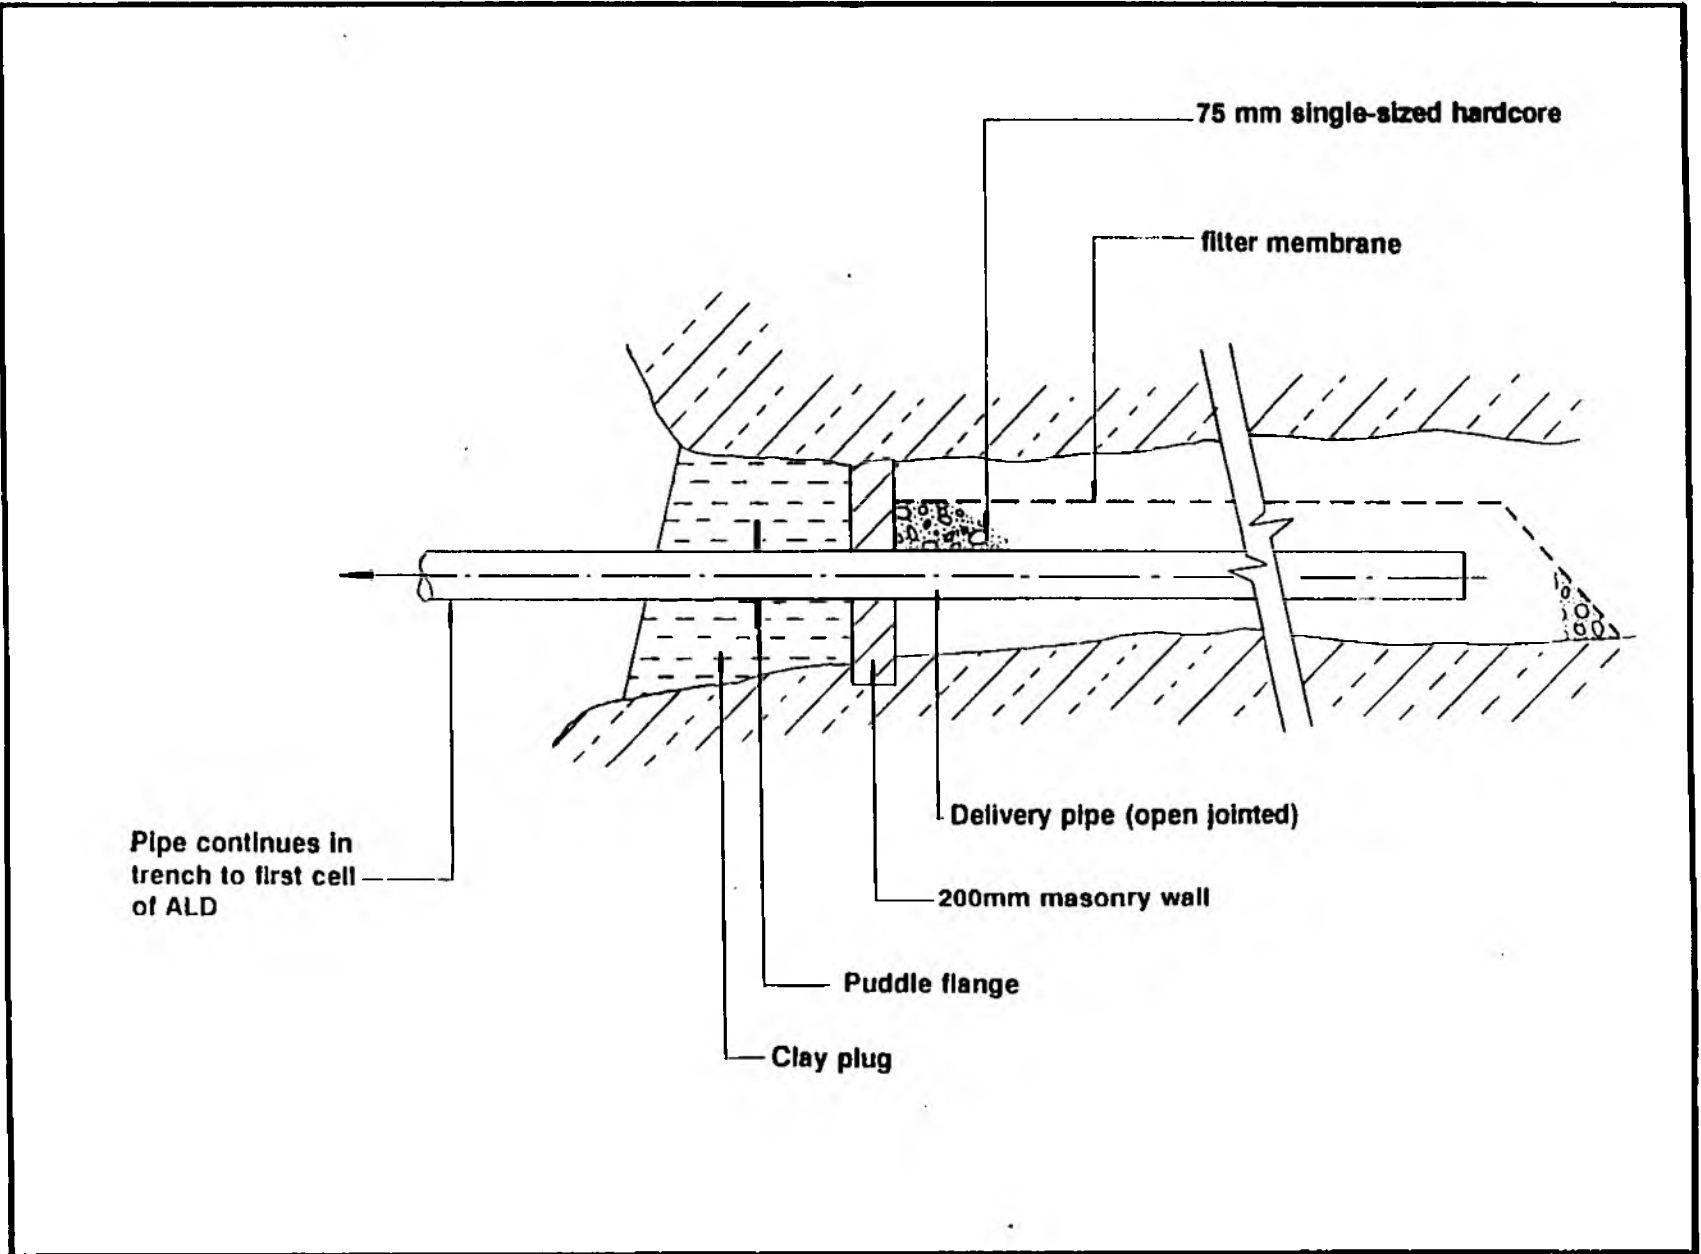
Typical headwall structure to intercept AMD at adit.
